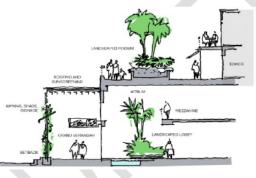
d – Street canopy (typical cross section)
